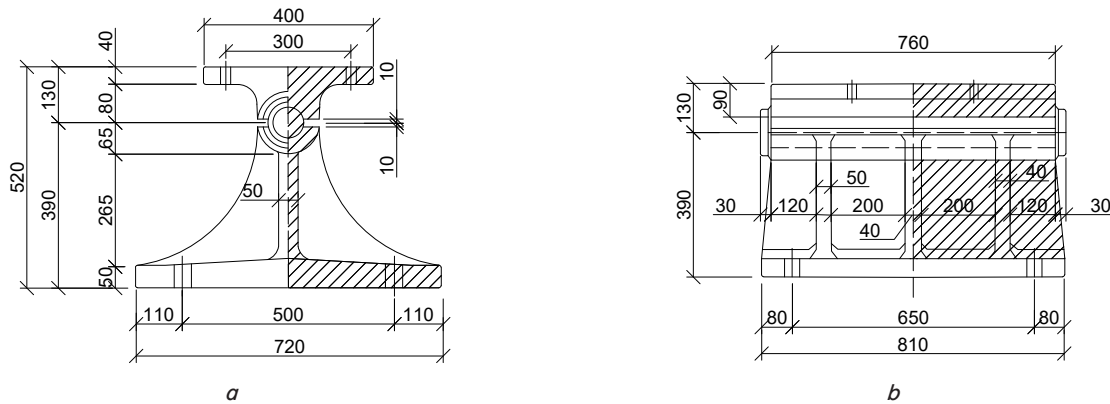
Fixed sector support part of PS: *a* – fixed part; *b* – support part
